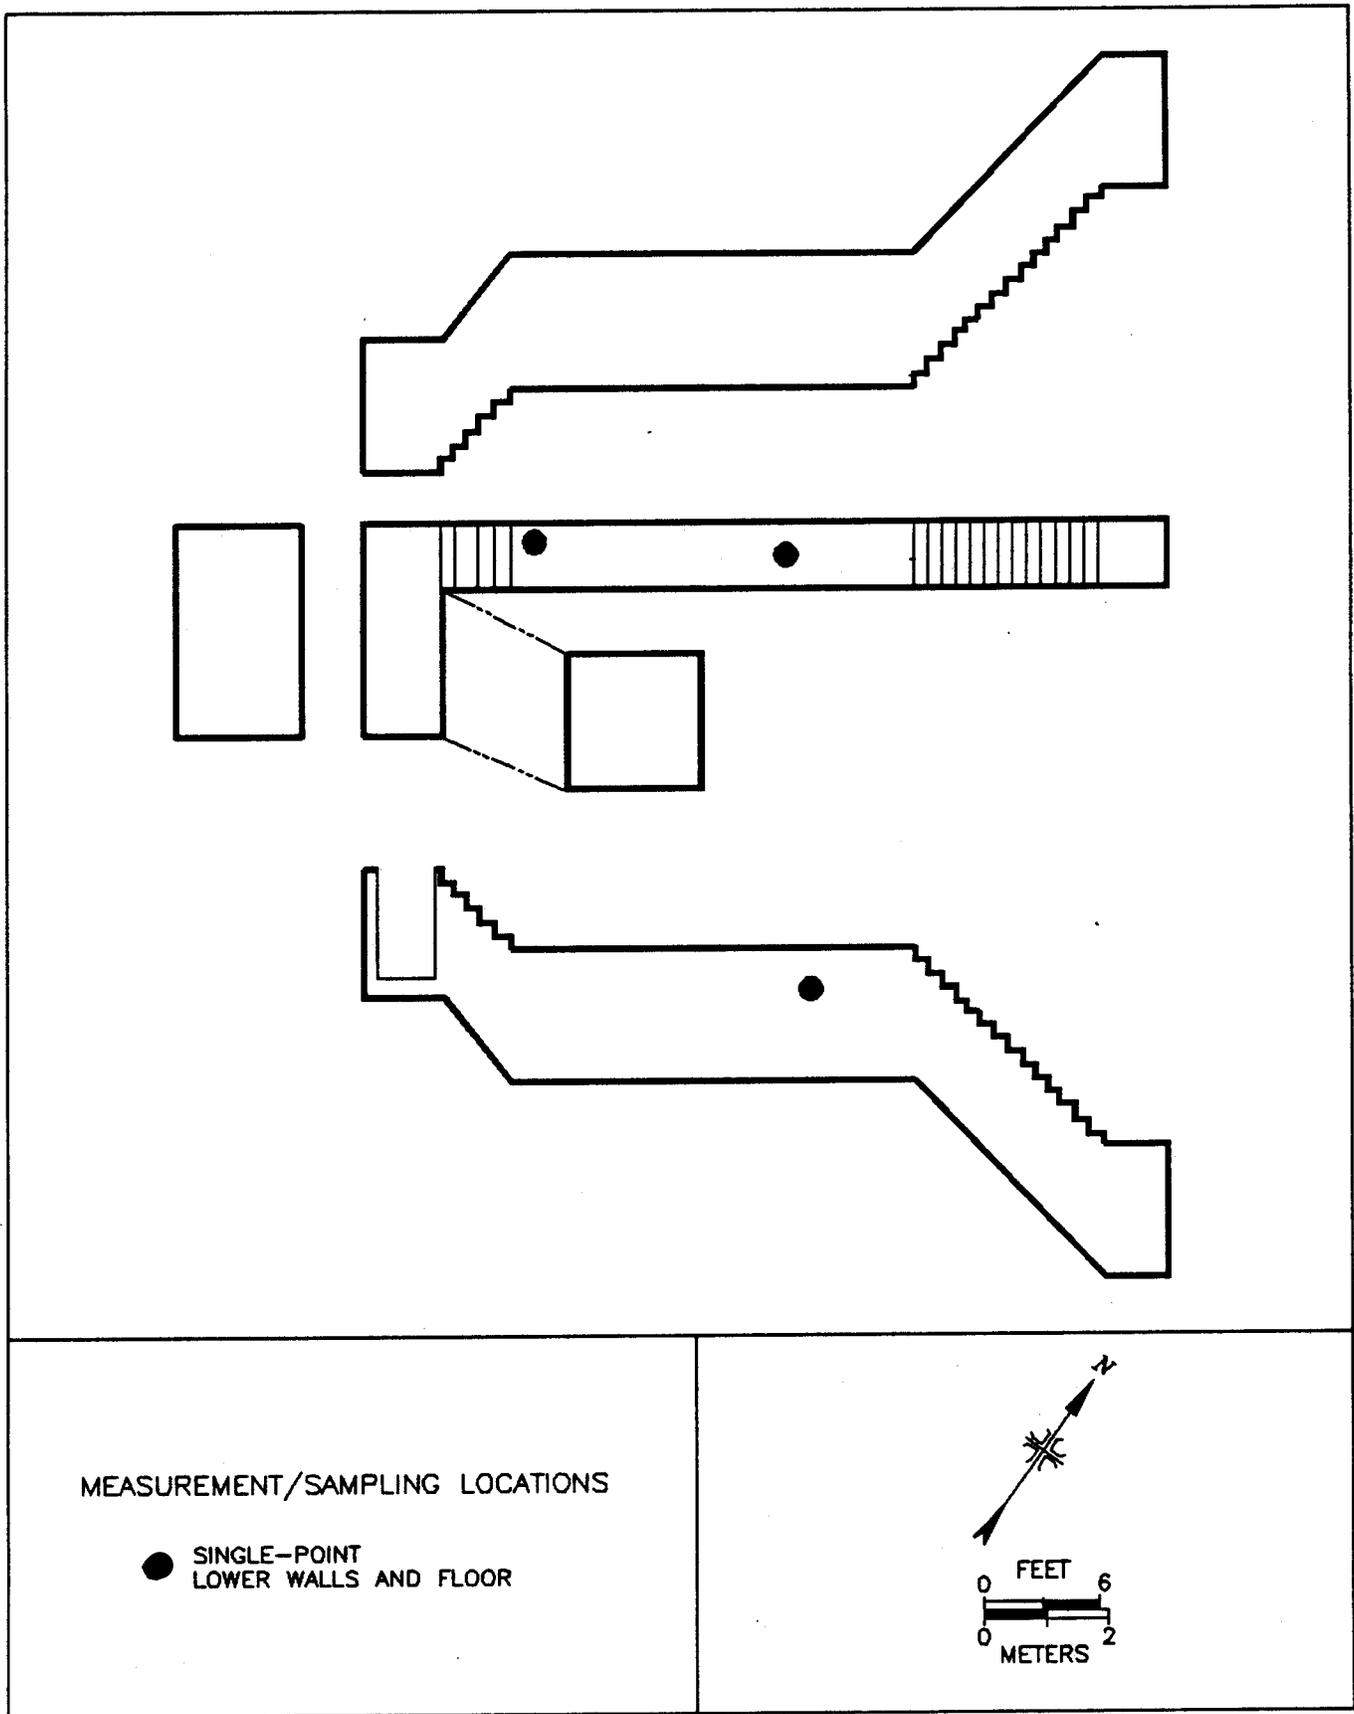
Building T028 Stairwell – Measurement and Sampling Locations
